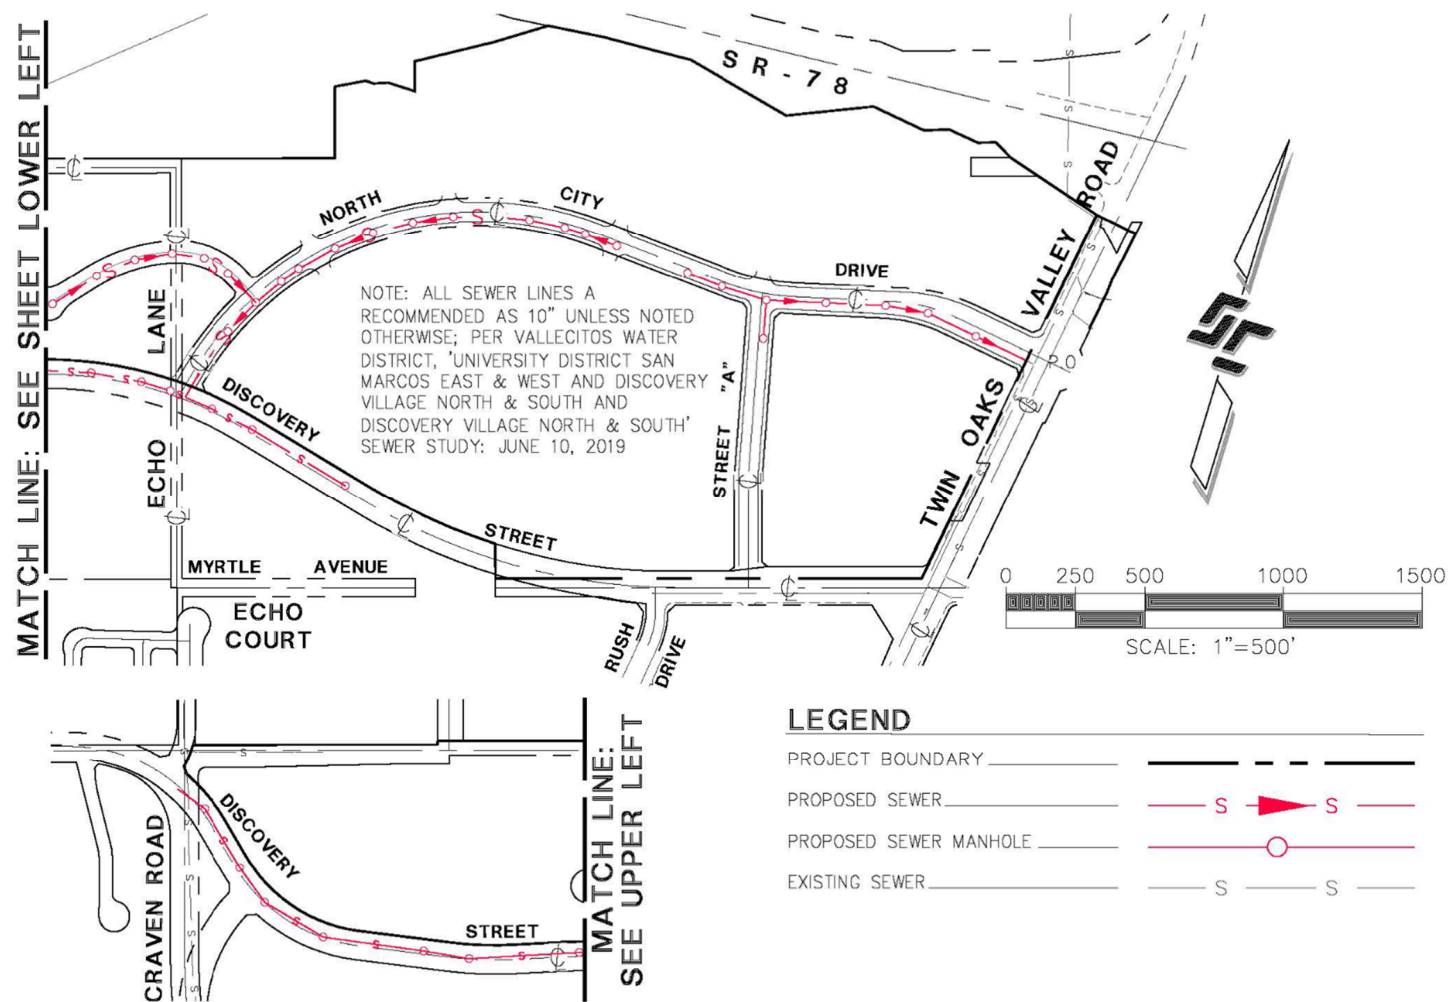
Proposed On-Site Sewer Facilities (West)
